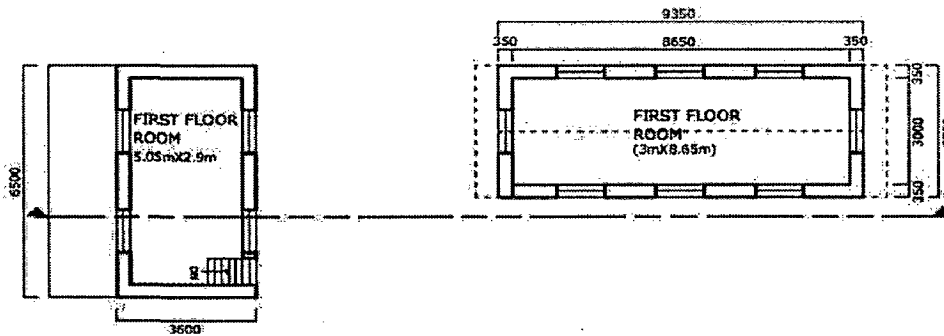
First floor plan of residence 1, in Vadakkencherry agraharam
